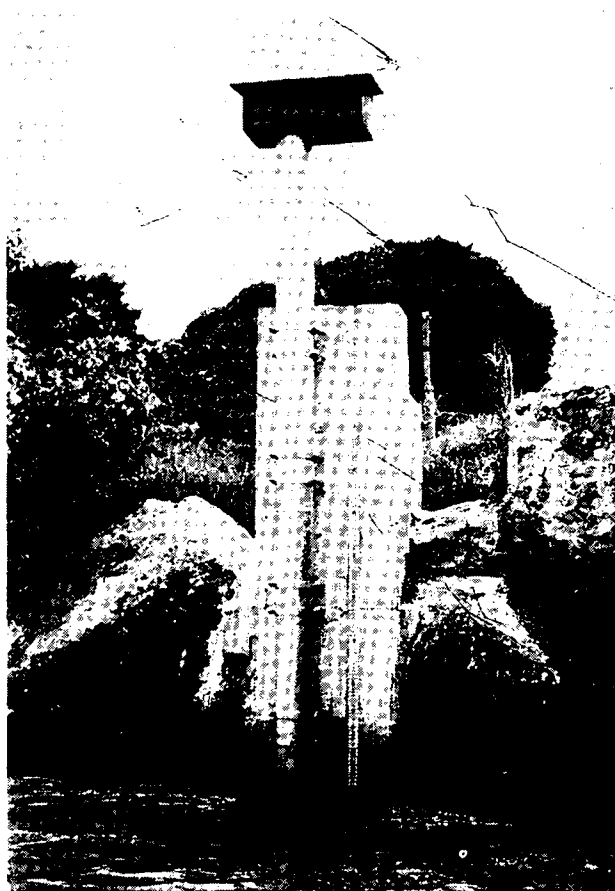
Water level recorder station; stilling well made of steel pipe, wooden «look-in» instrument shelter, supported by concrete pier (Little Ruaha at Ihimbu, Tanzania).
